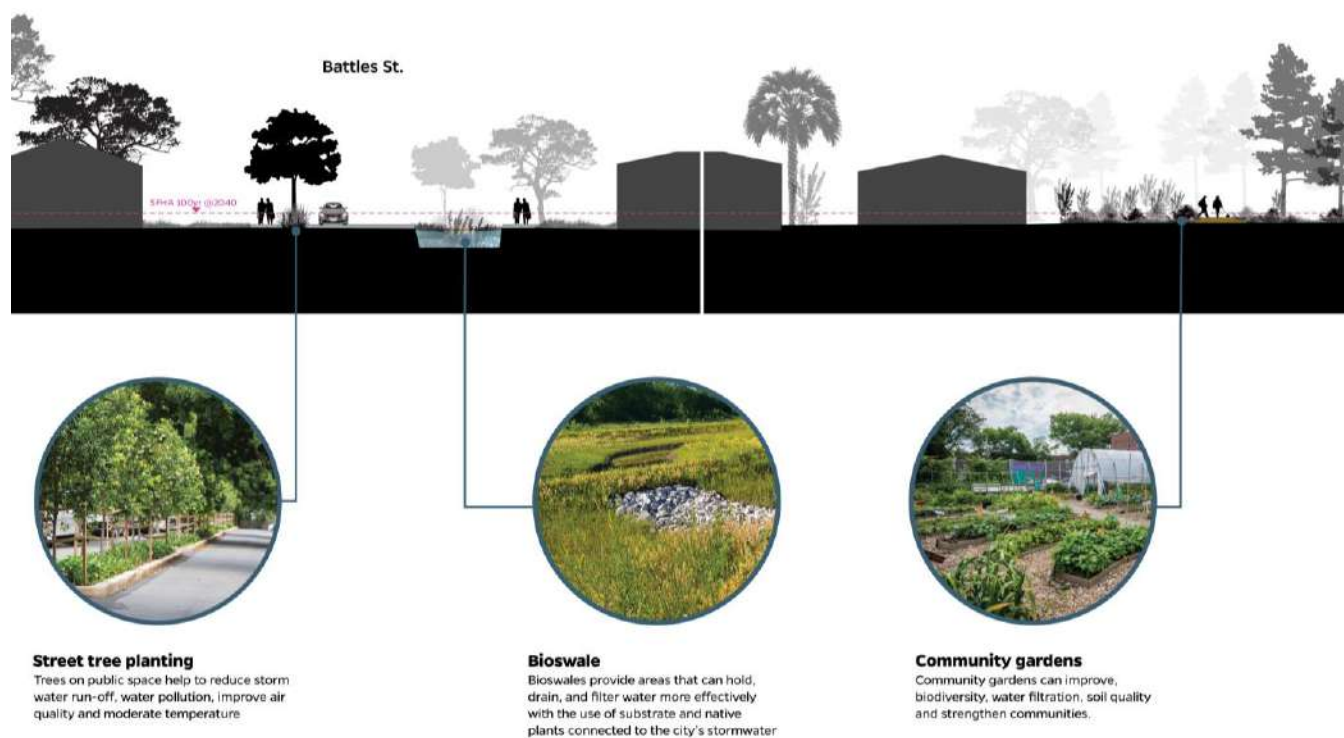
Adaptation Project Area 3: Drain Zone, Battles Street, Section.
